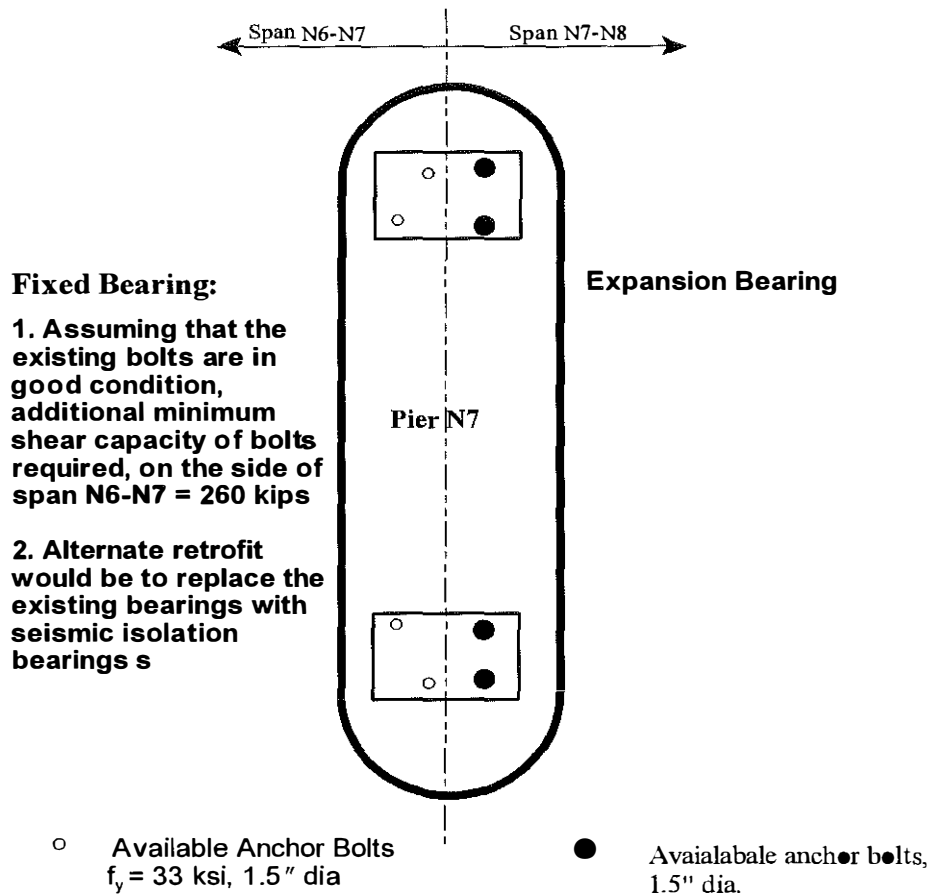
Minimum Required Shear Capacity ( $V_{req}$ ) to be Provided by Additional Anchor Bolts at Bearings of Pier N7 on the Evansville, IN Approach of the US41 Northbound Bridge
